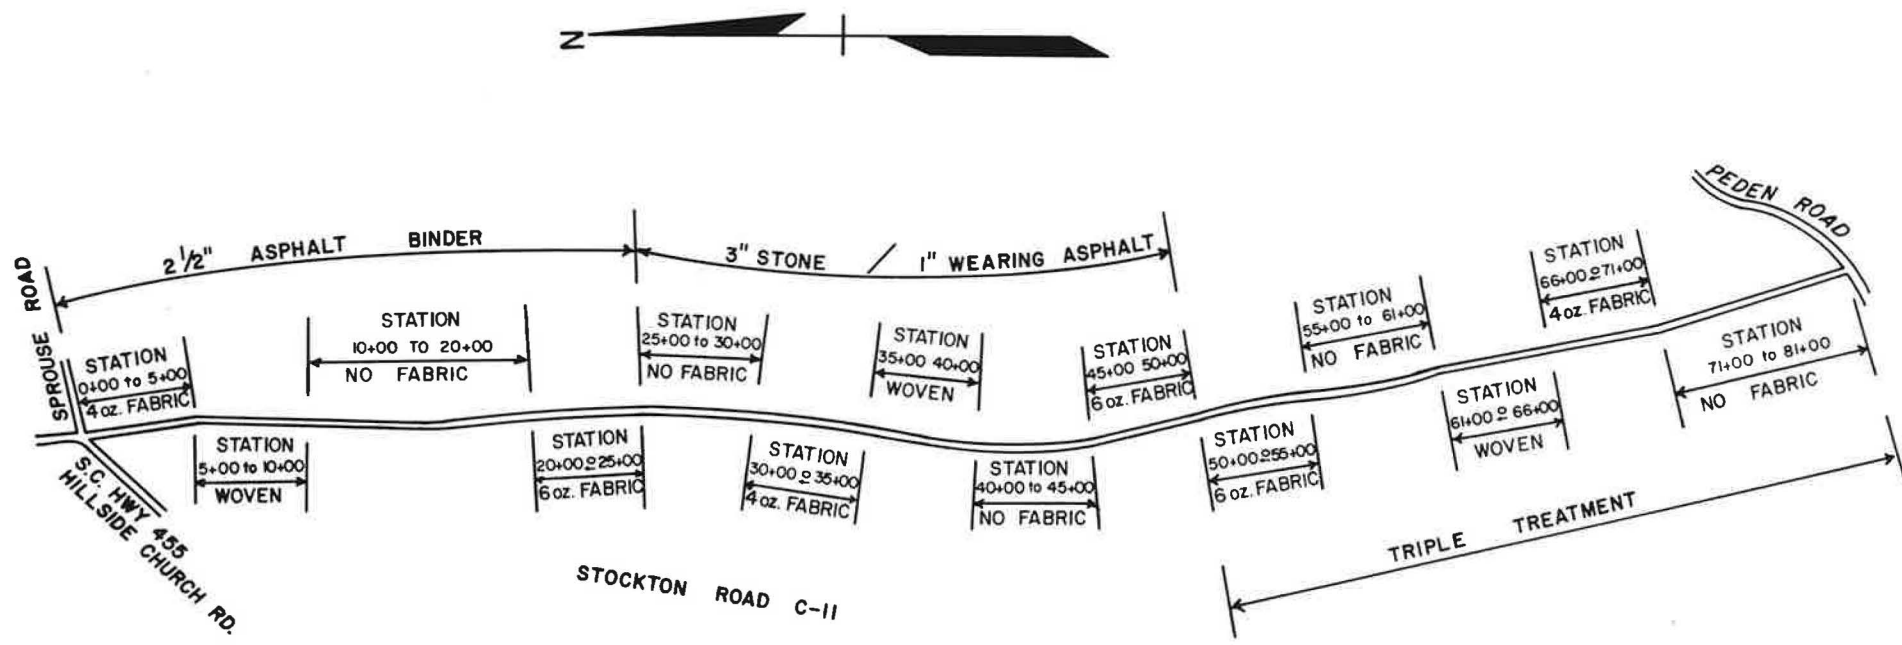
Stockton Road experimental paving plan of May 11, 1987.
